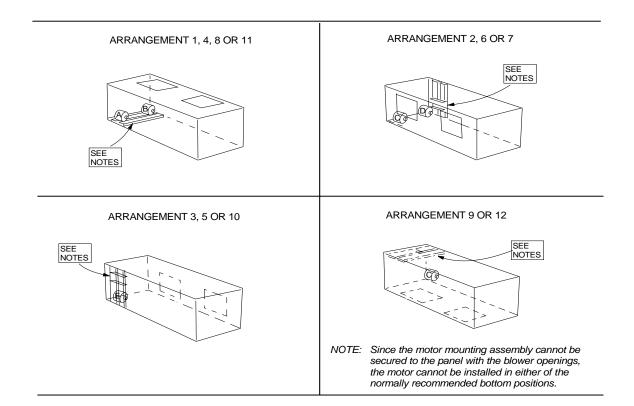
LA300/LB360/LB480 MOTOR ARRANGEMENTS
